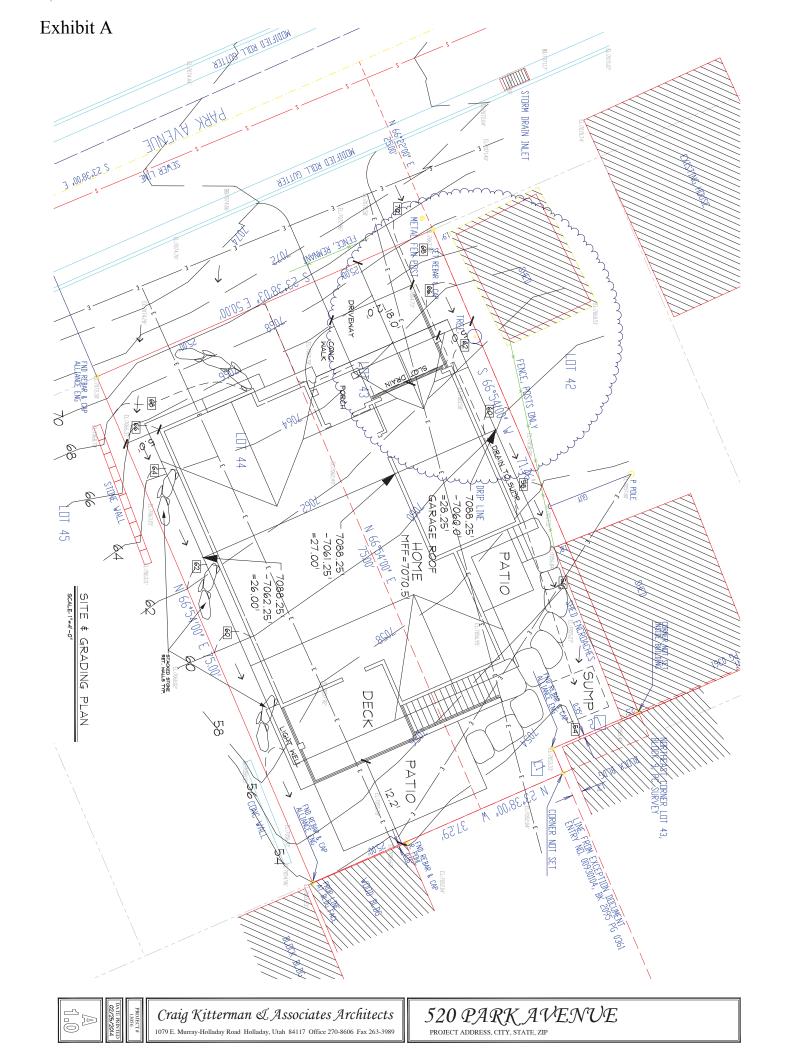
Exhibit A- Plans (existing conditions, site plan, elevations, floor plans)
